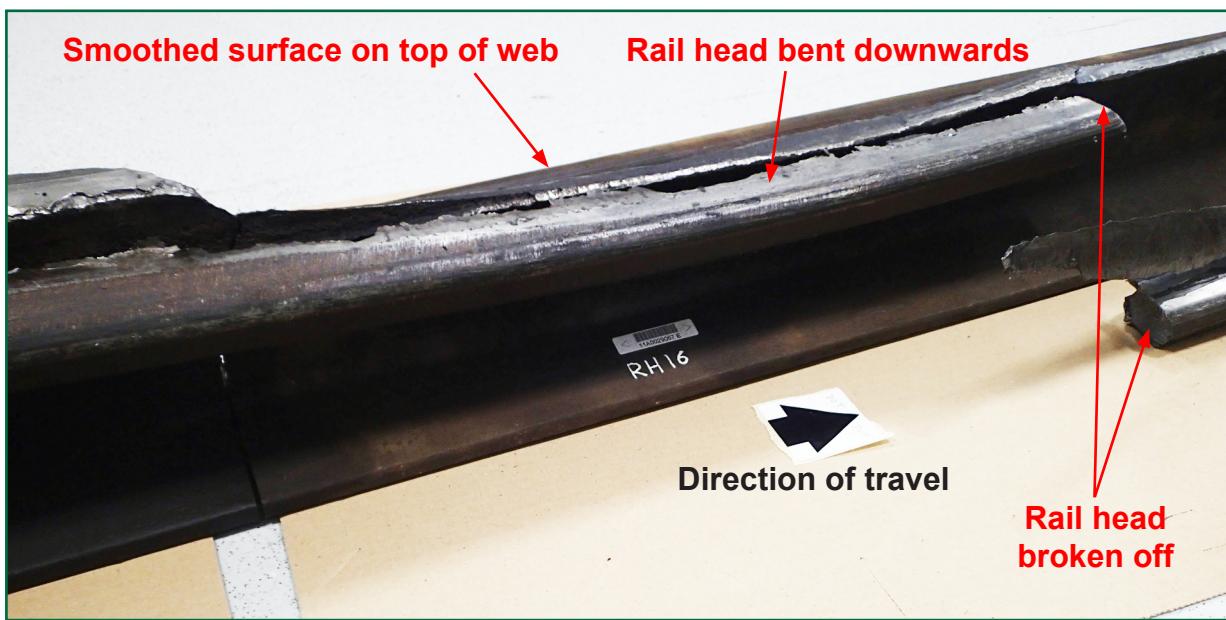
Fractured section of rail, showing smoothed surface of fractured web
